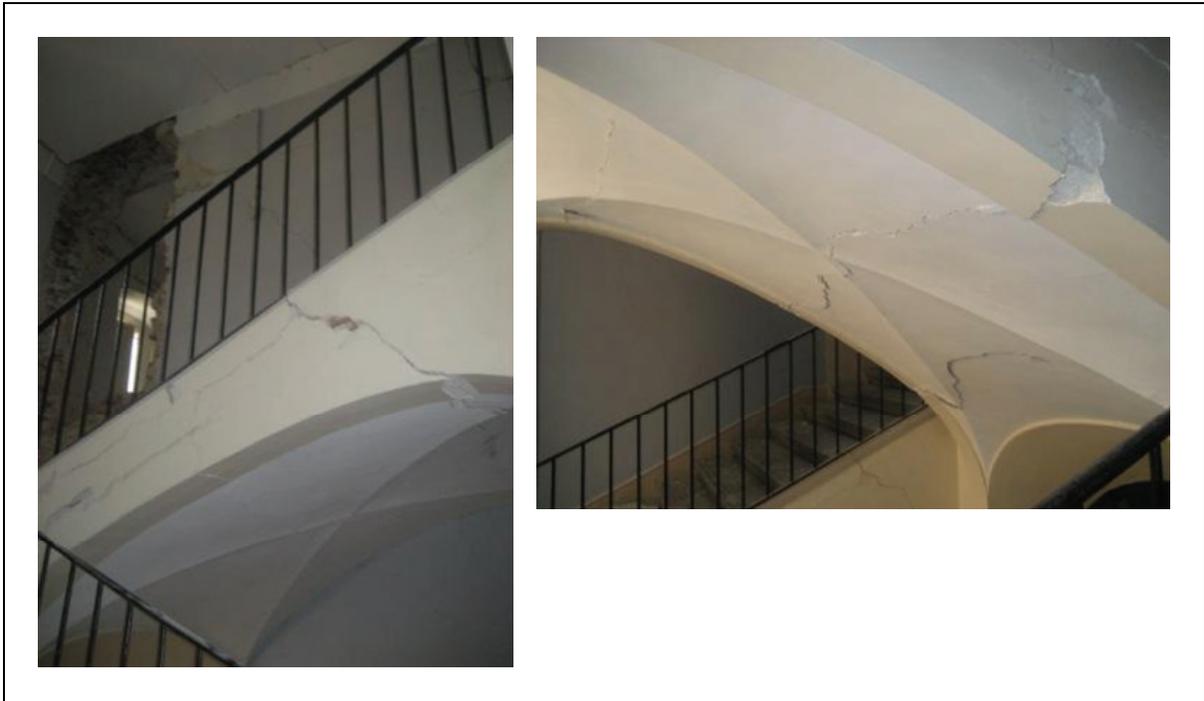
Shear cracks in the vaults of the stairs on the first and second story level
